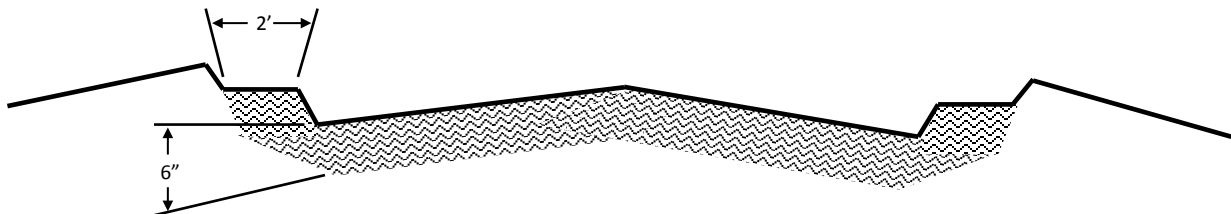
Typical Cross-Section of Roadway Subgrade Requiring Scarification
